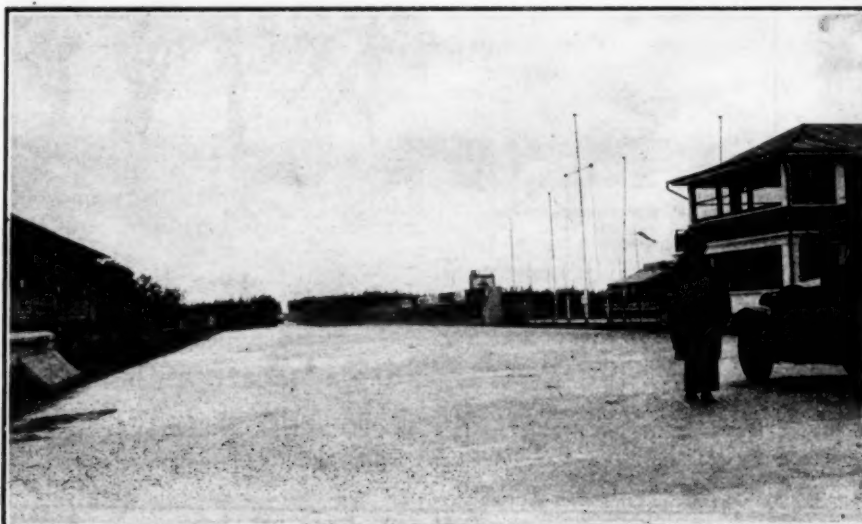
Plain Concrete on Nurburg Ring, Germany
